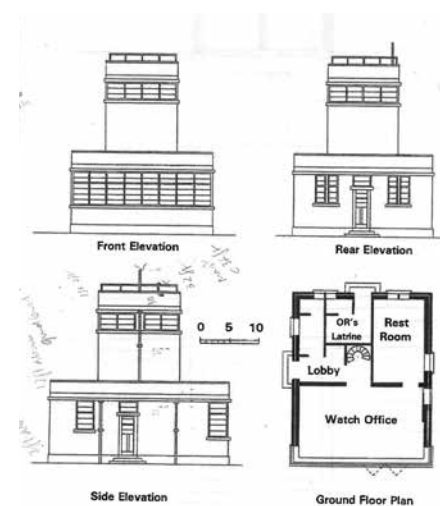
Grade II listed Watch Office with Tower. The Watch Office allowed views over the airfield, the roof of the Watch Office, the observation tower and the roof of the tower allowed 360 degree views to the surrounding countryside. This building, the pillarboxes and trenches needed clear views for defence. Before radio communication between ground and air, visual contact would have been very important to signal clearance for planes to land and take off.
